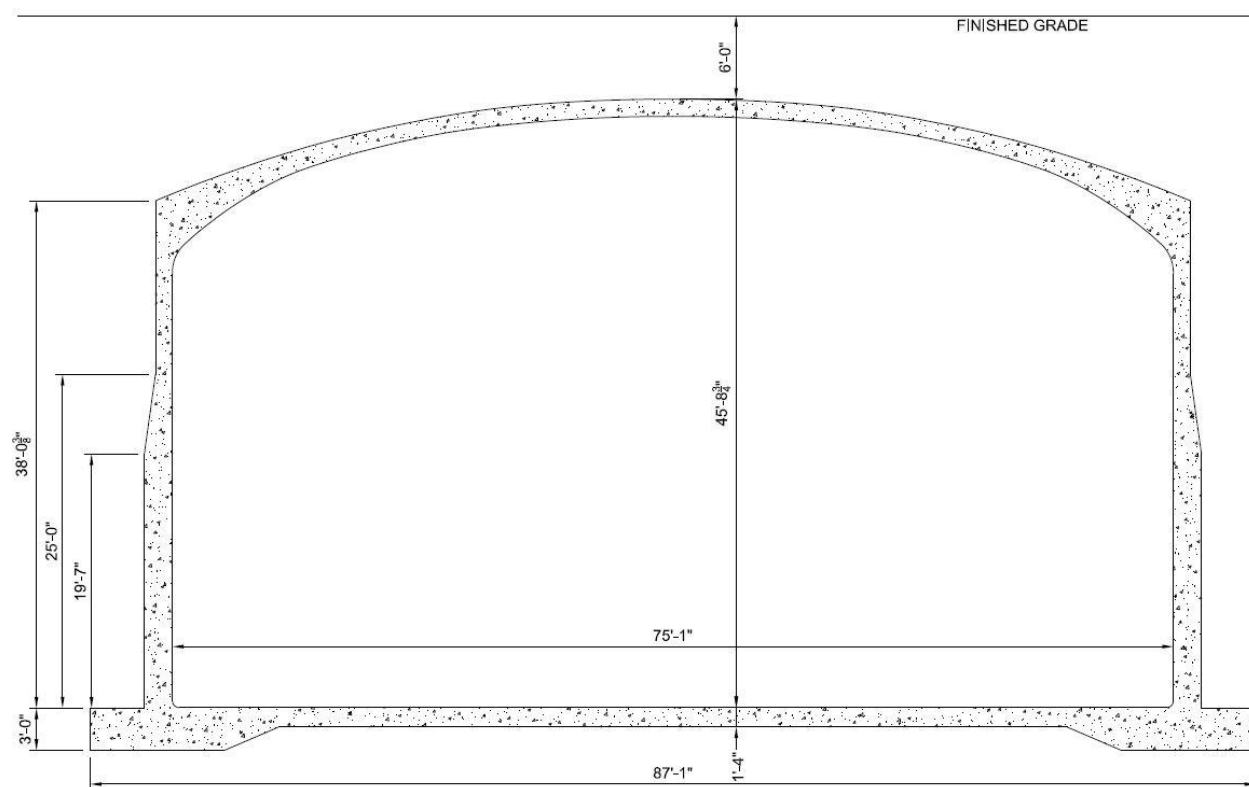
Tank Type IV-C Cross-Section AX Tank Farm (H-2-44562)
